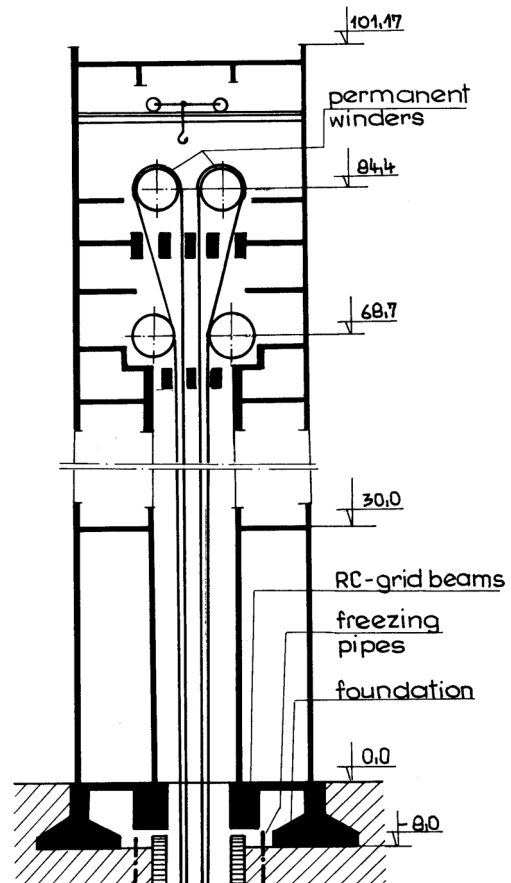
Reinforced concrete hoisting tower constructed before commencement of shaft sinking by application of the ground freezing method
